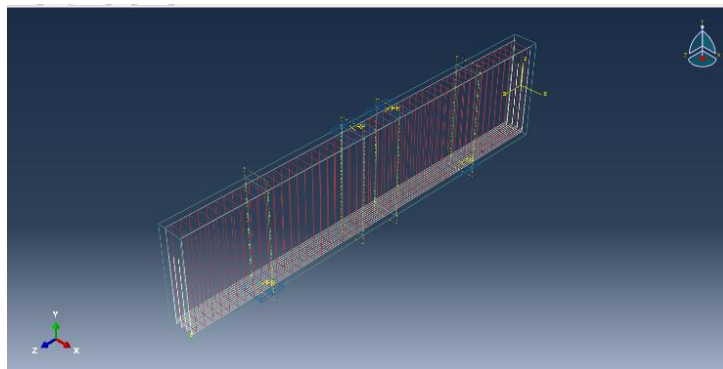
Assembly of CFRP Longitudinal bars and stirrups.
